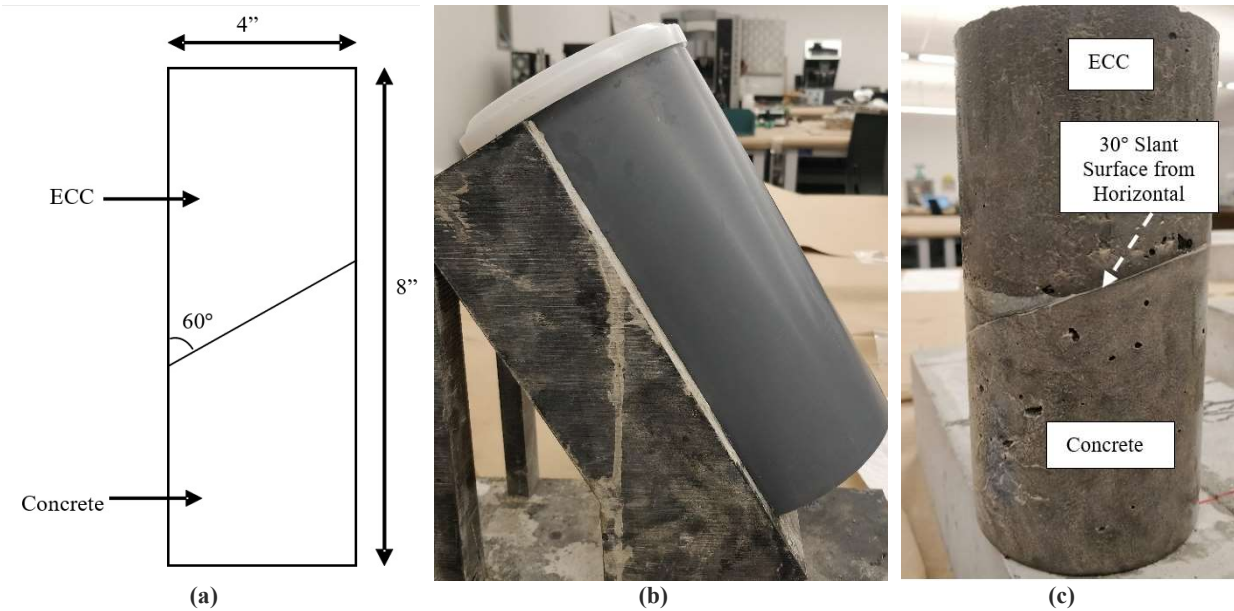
Slant shear test: (a) Cylinder dimension (b) Specimen in a mold (c) Composite cylinder with two material layers
